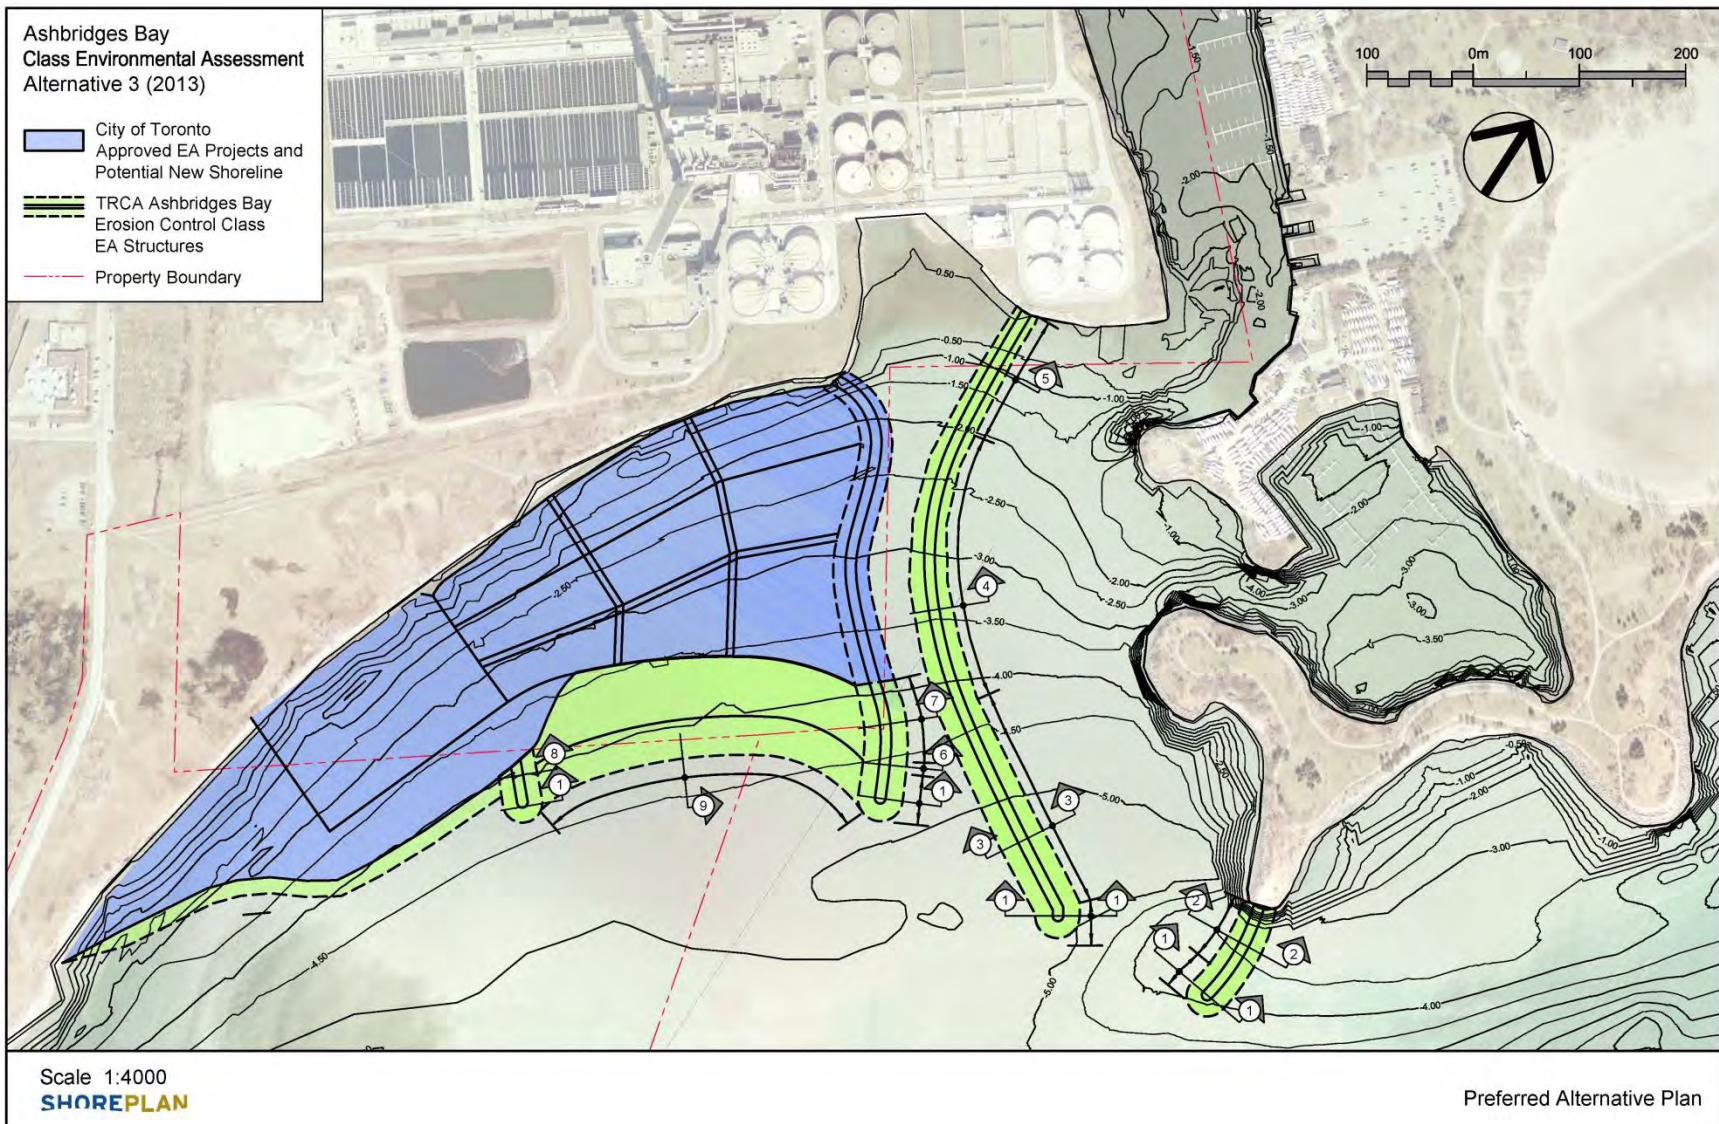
Preferred Alternative (Alternative 3) – plan view.
